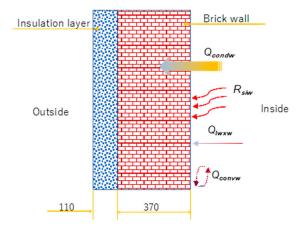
Heat transfers in the greenhouse wall (unit, mm).
